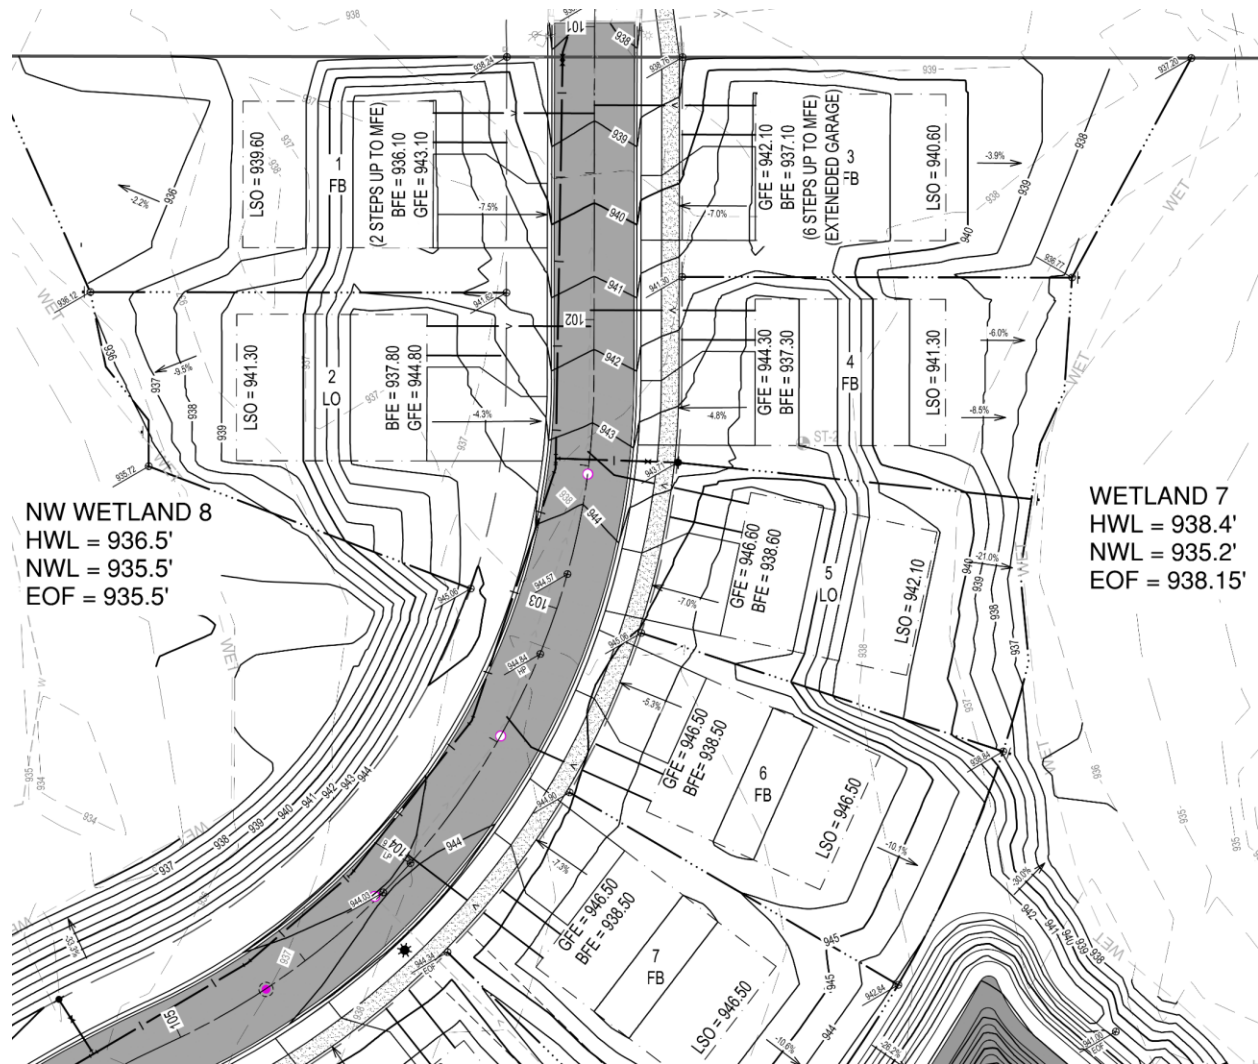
Structure Elevations for Lots 1 through 7 (LSO = Low Opening, BFE = Low Floor)
